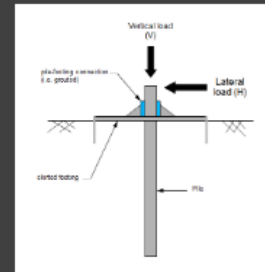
Structural arrangement of the decoupled hybrid monopile-footing foundation system
